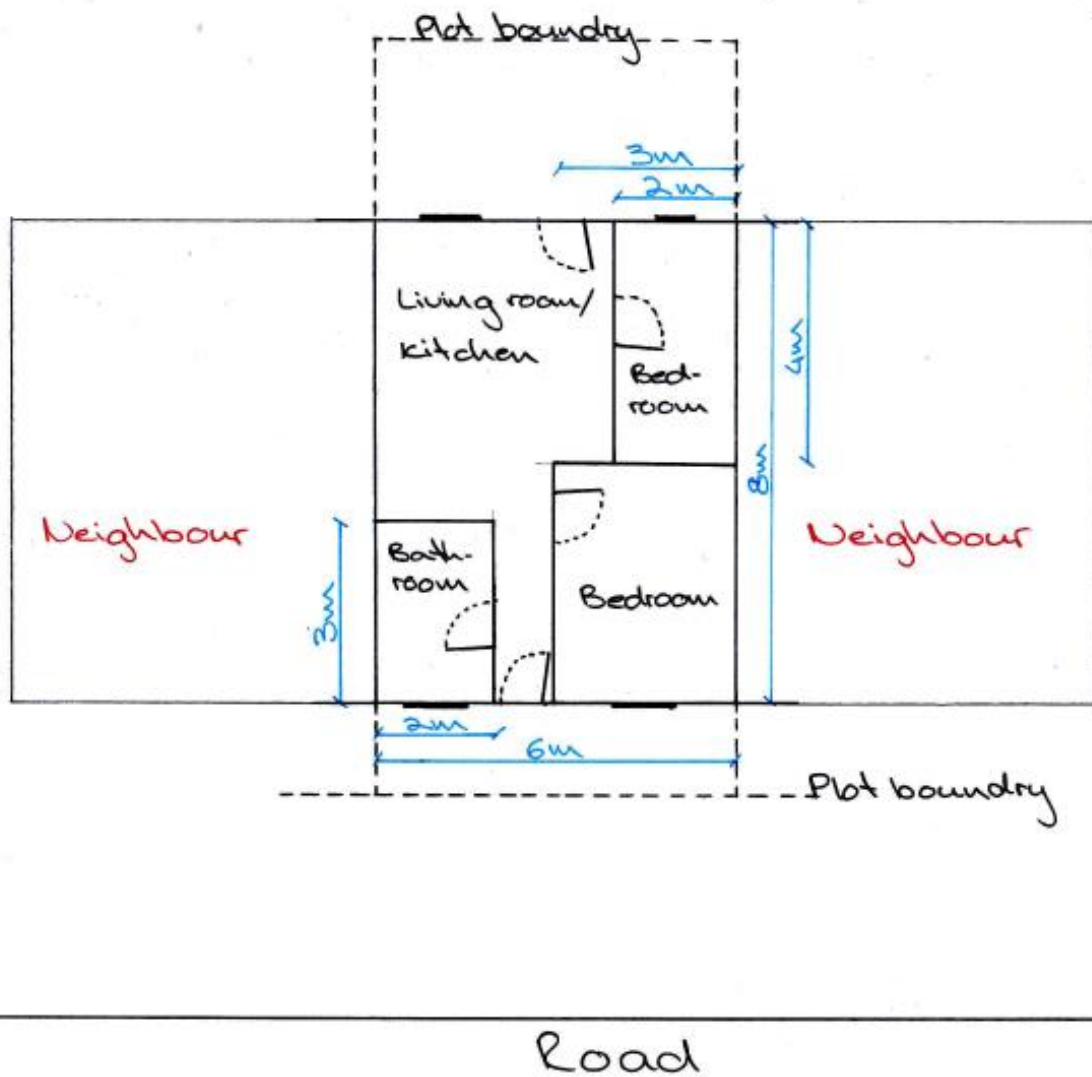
Figure C: Plan drawing of the house that was constructed indicating size and the location of doors and windows (Author's construct, 2015).
